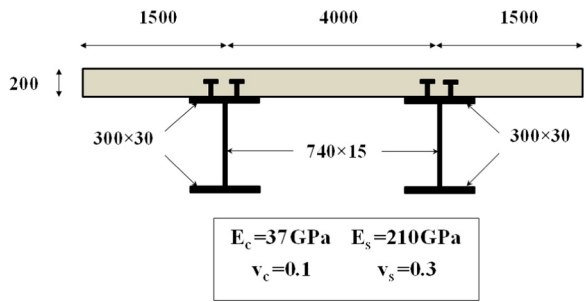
Cross-section dimensions and material characteristic of the simply supported twin-girder composite deck (all dimensions in mm).
